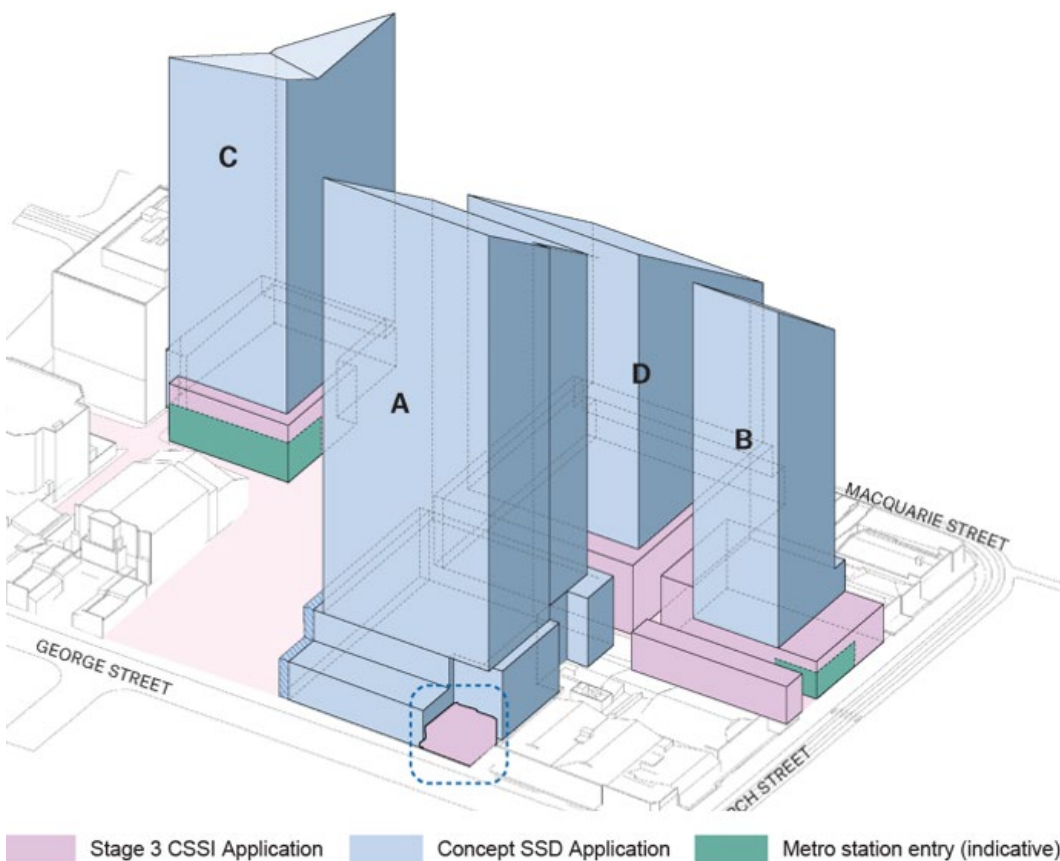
Proposed Building Envelopes – Isometric View (looking west)
